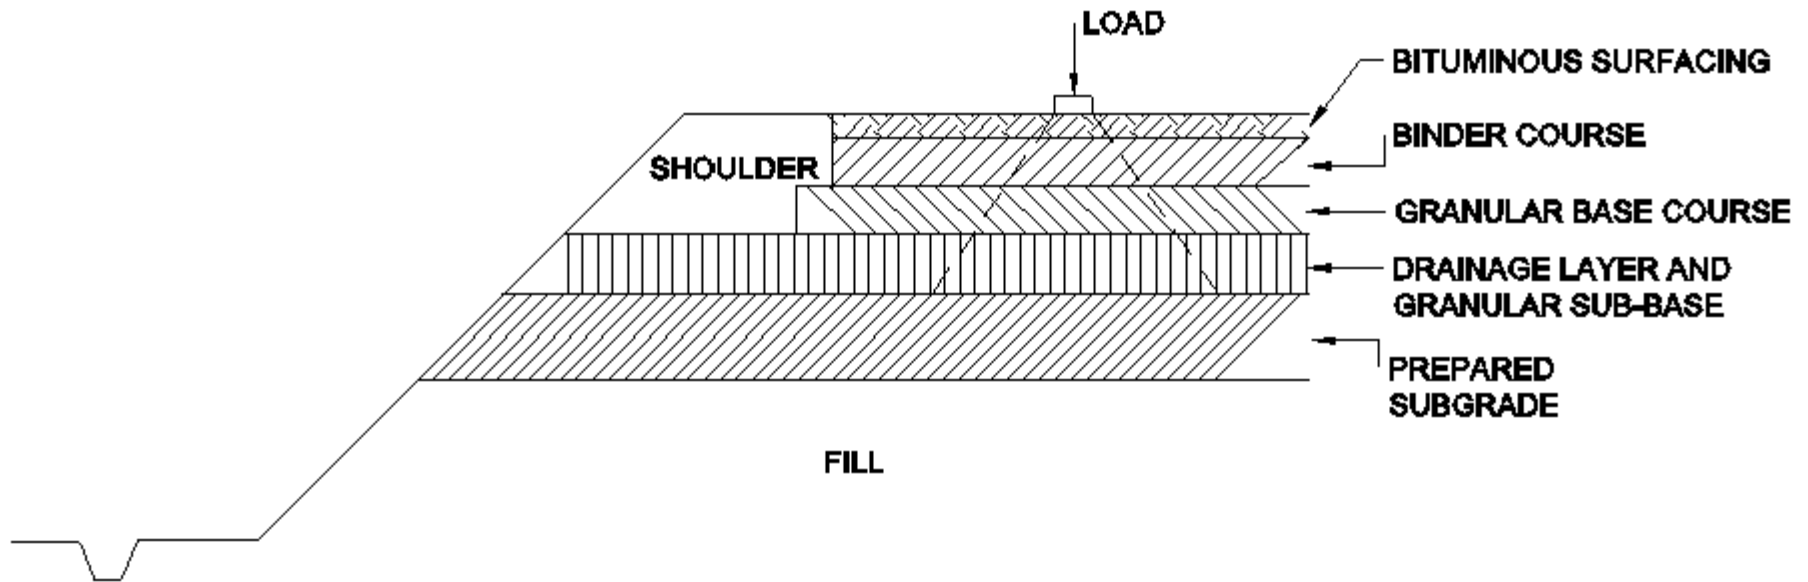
TYPICAL CROSS SECTION OF FLEXIBLE PAVEMENT
